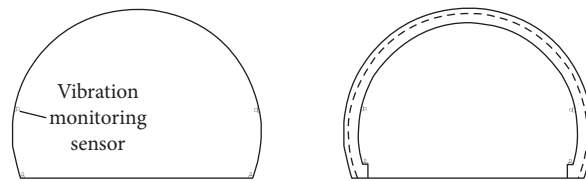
Layout of vibration sensor on tunnel excavation face.
